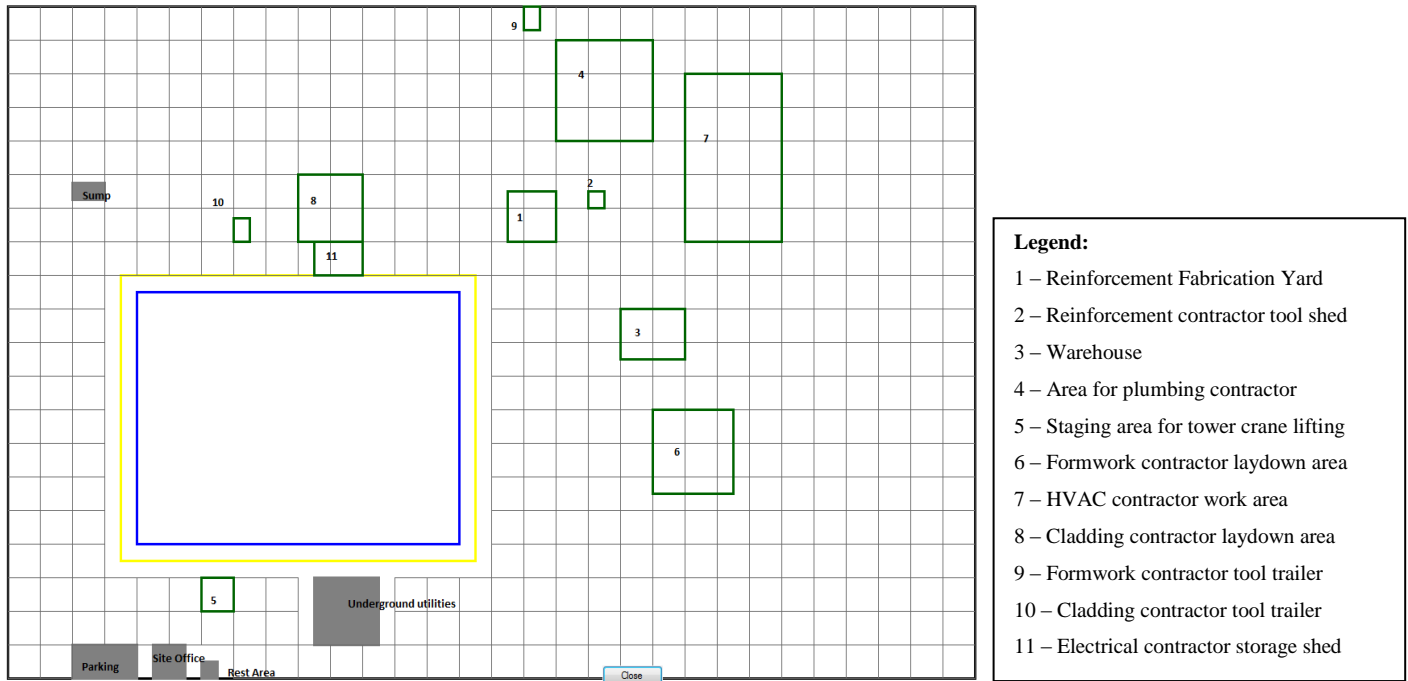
CONSITEPLAN – Site Utilization Plan 2
